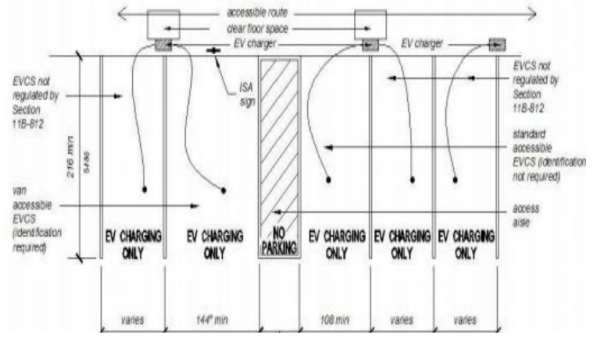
Sample layout with 5 EV Chargers, 1 Van Accessible Stall, and 1 Standard Accessible Stall
